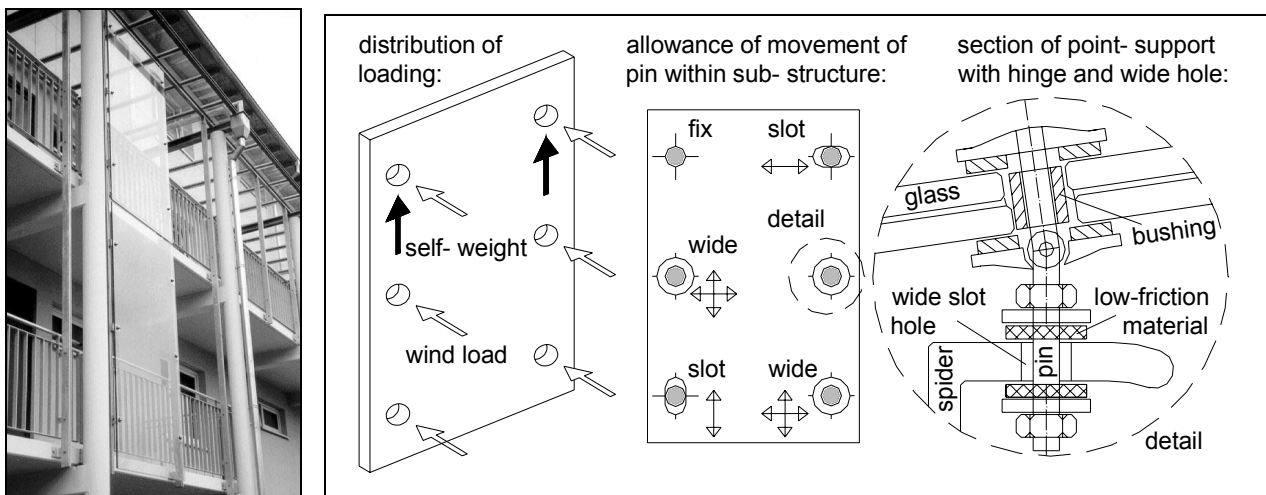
Example of a point-supported glazing panel and its support conditions (sub-structure)
